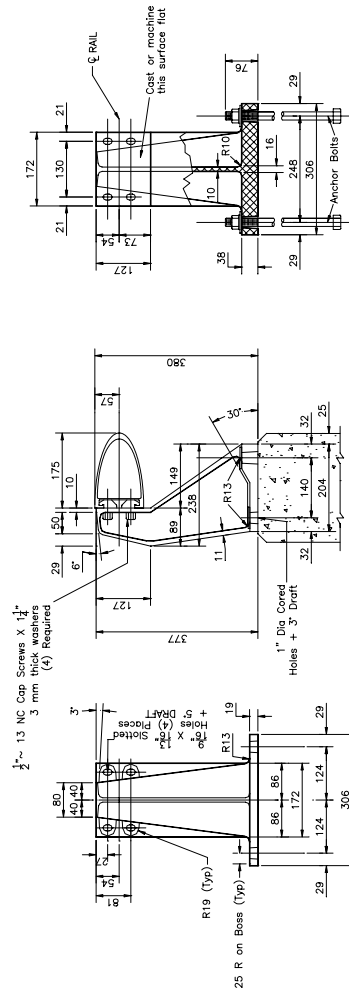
Details of the Texas Type T4(A) Bridge Rail – Concrete Deck and Wall.
